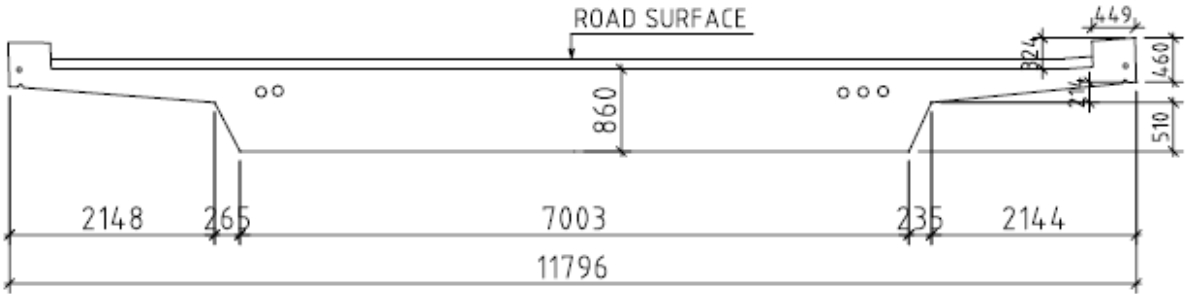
Cross section of Haavistonjoki Bridge (Kerokoski, 2006).
